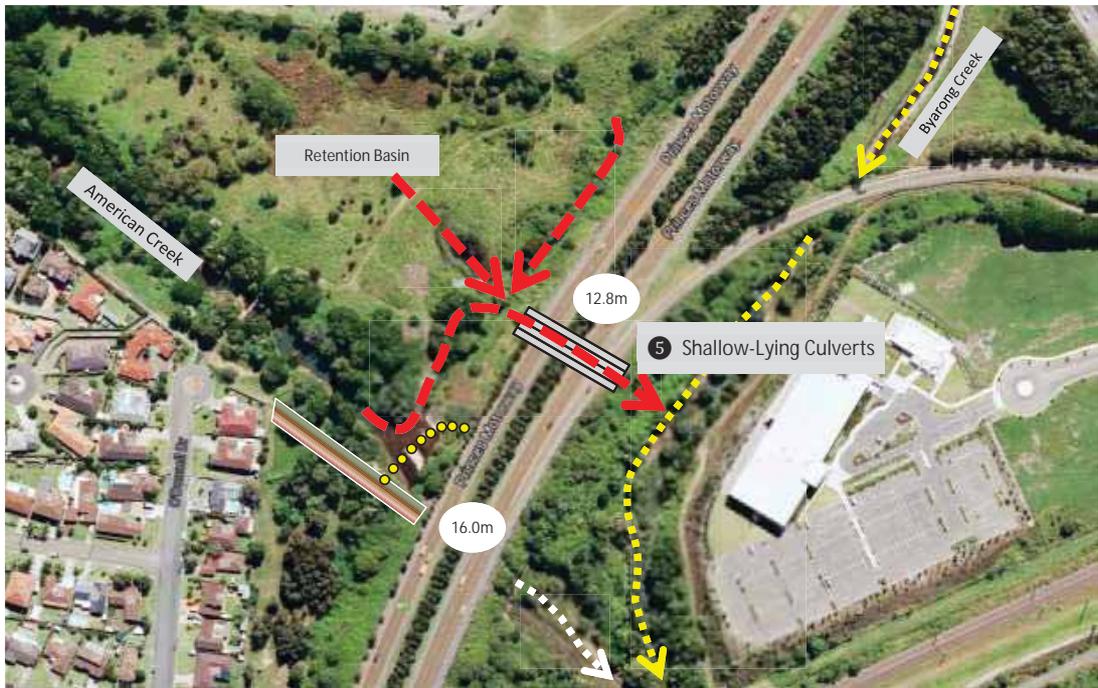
Location of the proposed shallow-lying culverts, approximately 150 – 200 metres north of the current culverts
